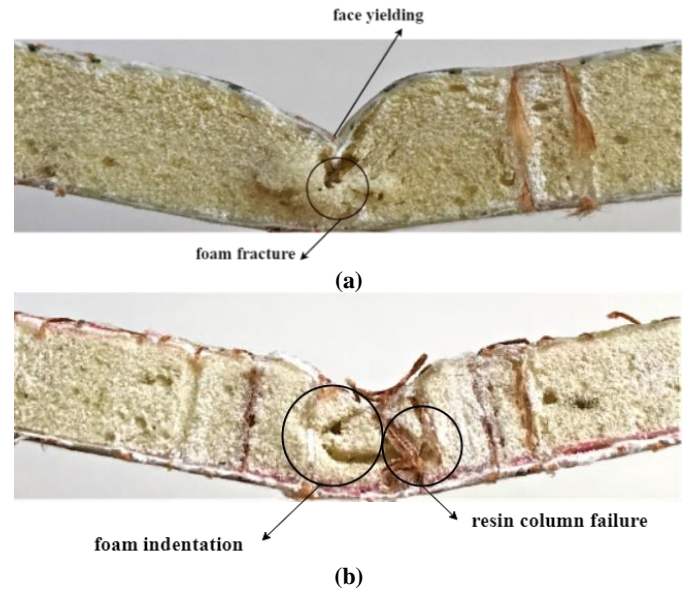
Different failure modes; a) Face sheet yielding and foam core fracture, b) Foam indentation and resin column failure
